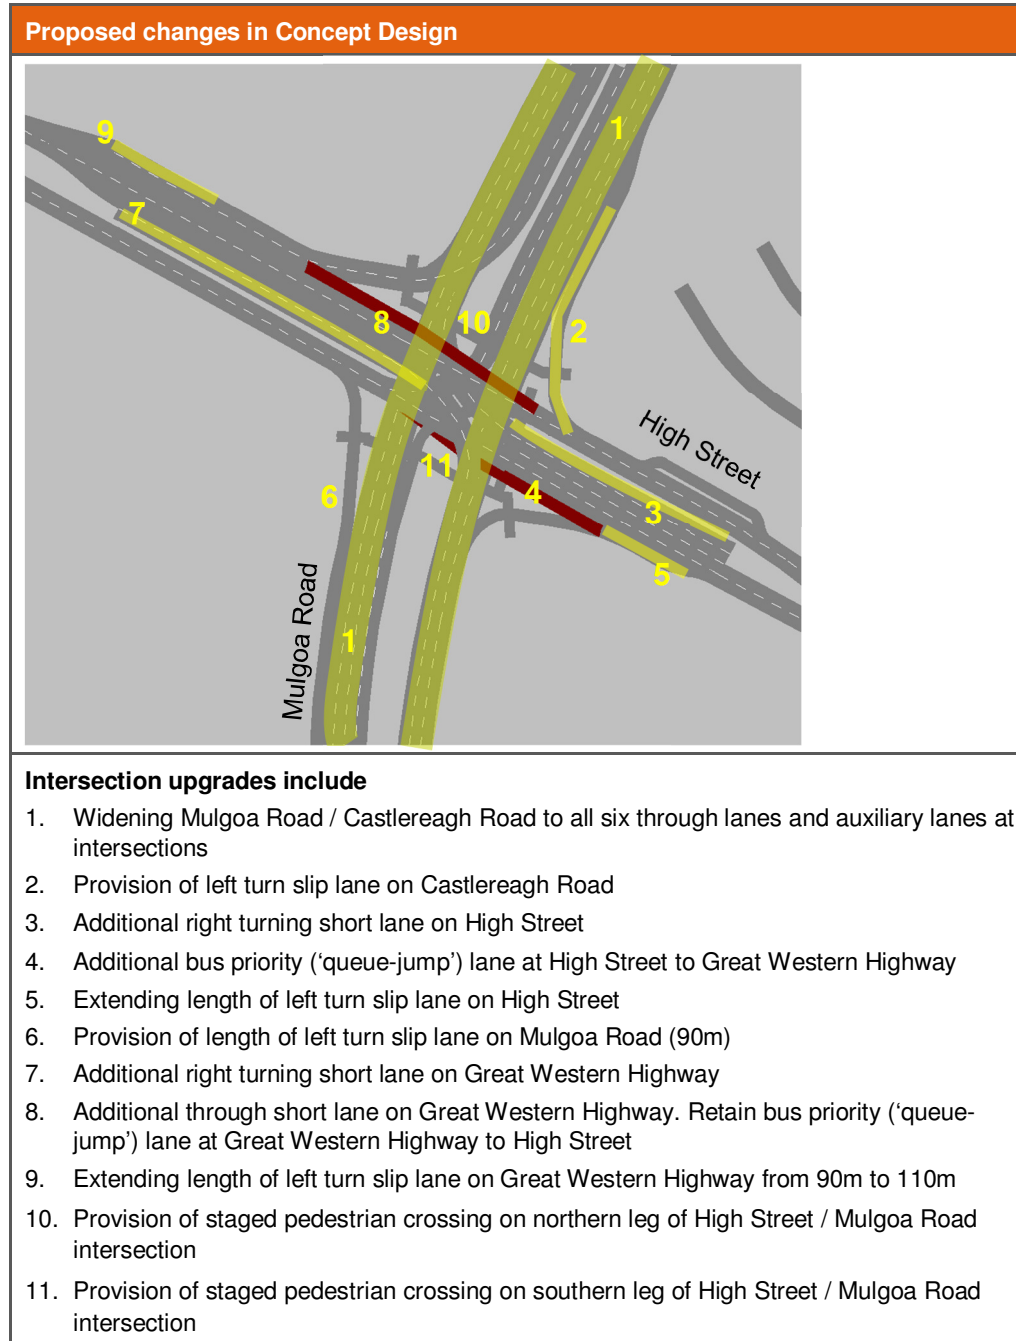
Proposed Layout of Great Western Highway/Mulgoa Road/High Street Intersection
